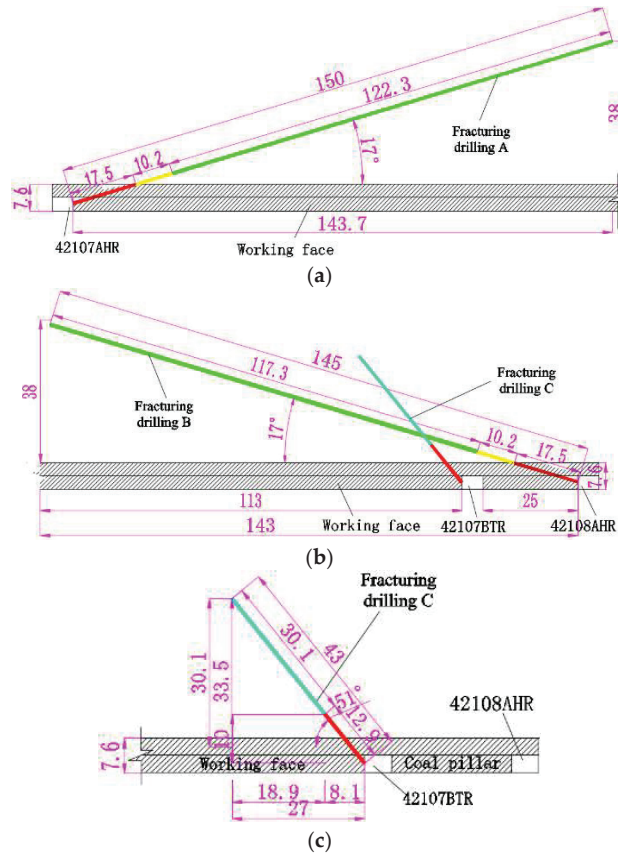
Schematic diagram of hydraulic fracturing technical scheme parameters: (a) parameters of hydraulic fracture drill holes in 42107AHR, (b) parameters of hydraulic fracture drill holes in 42108AHR, and (c) parameters of hydraulic fracture drill holes in 42107BTR.
